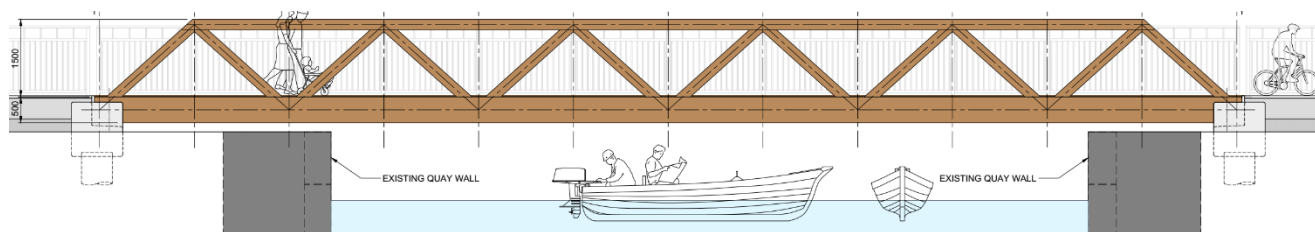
Artistic Impression of the Footbridge over the Dry Dock
